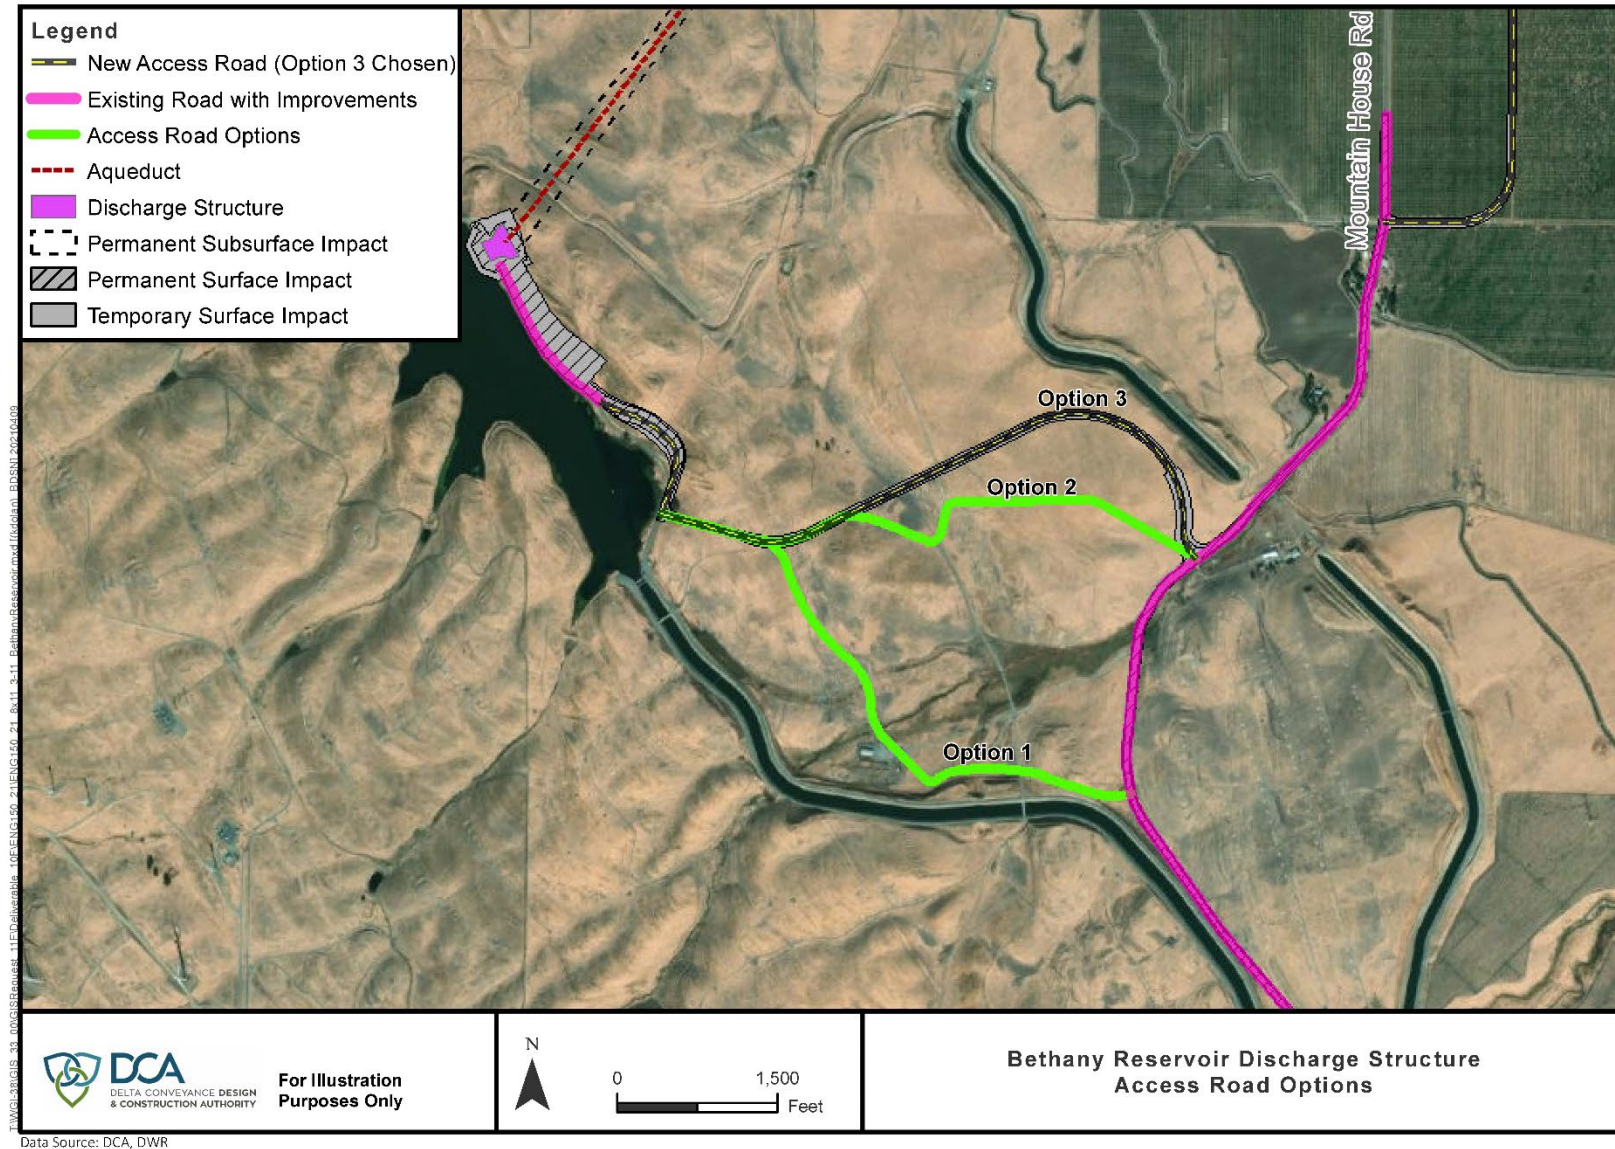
Bethany Reservoir Discharge Structure Access Road Options
